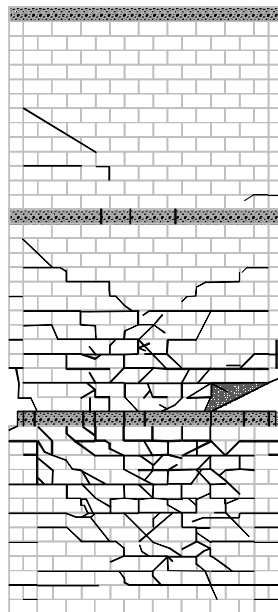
Crack Pattern of Wall 10 at Failure
